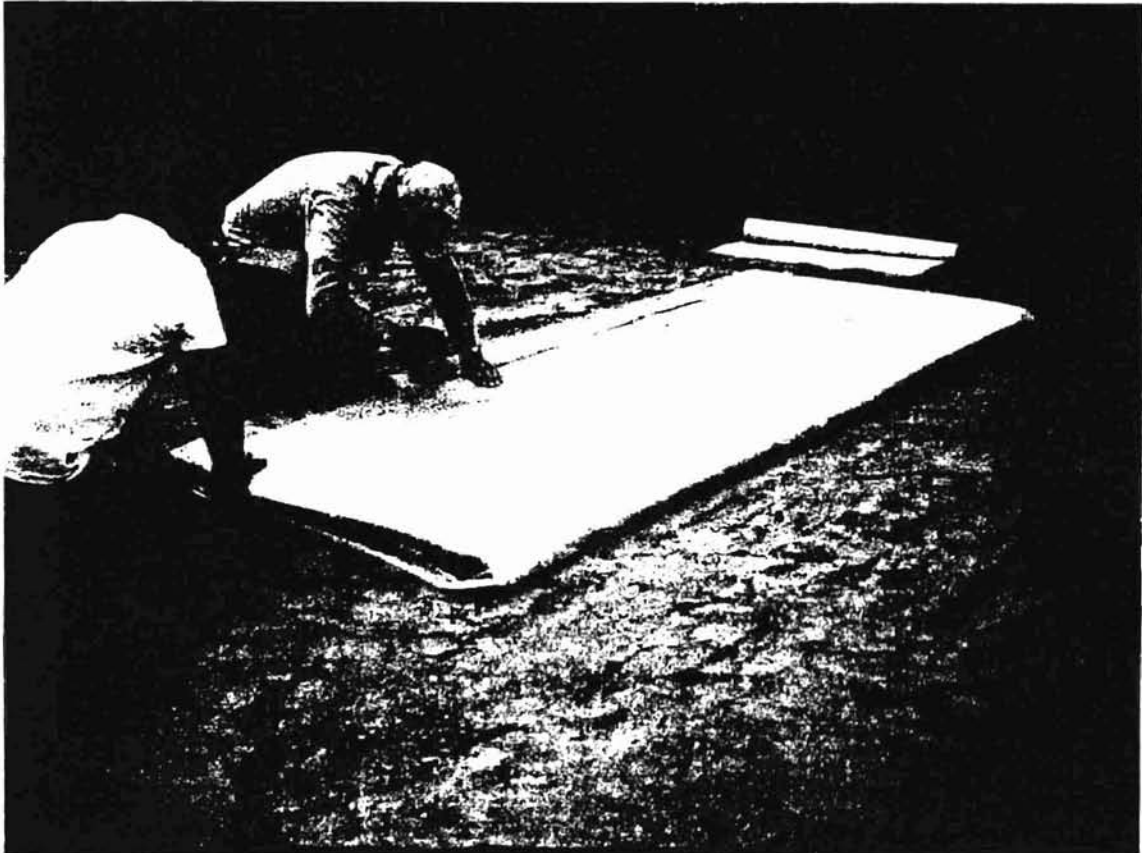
Wrapping of Cardboard Spacing for Geotextile Reinforced Backfill, B1
